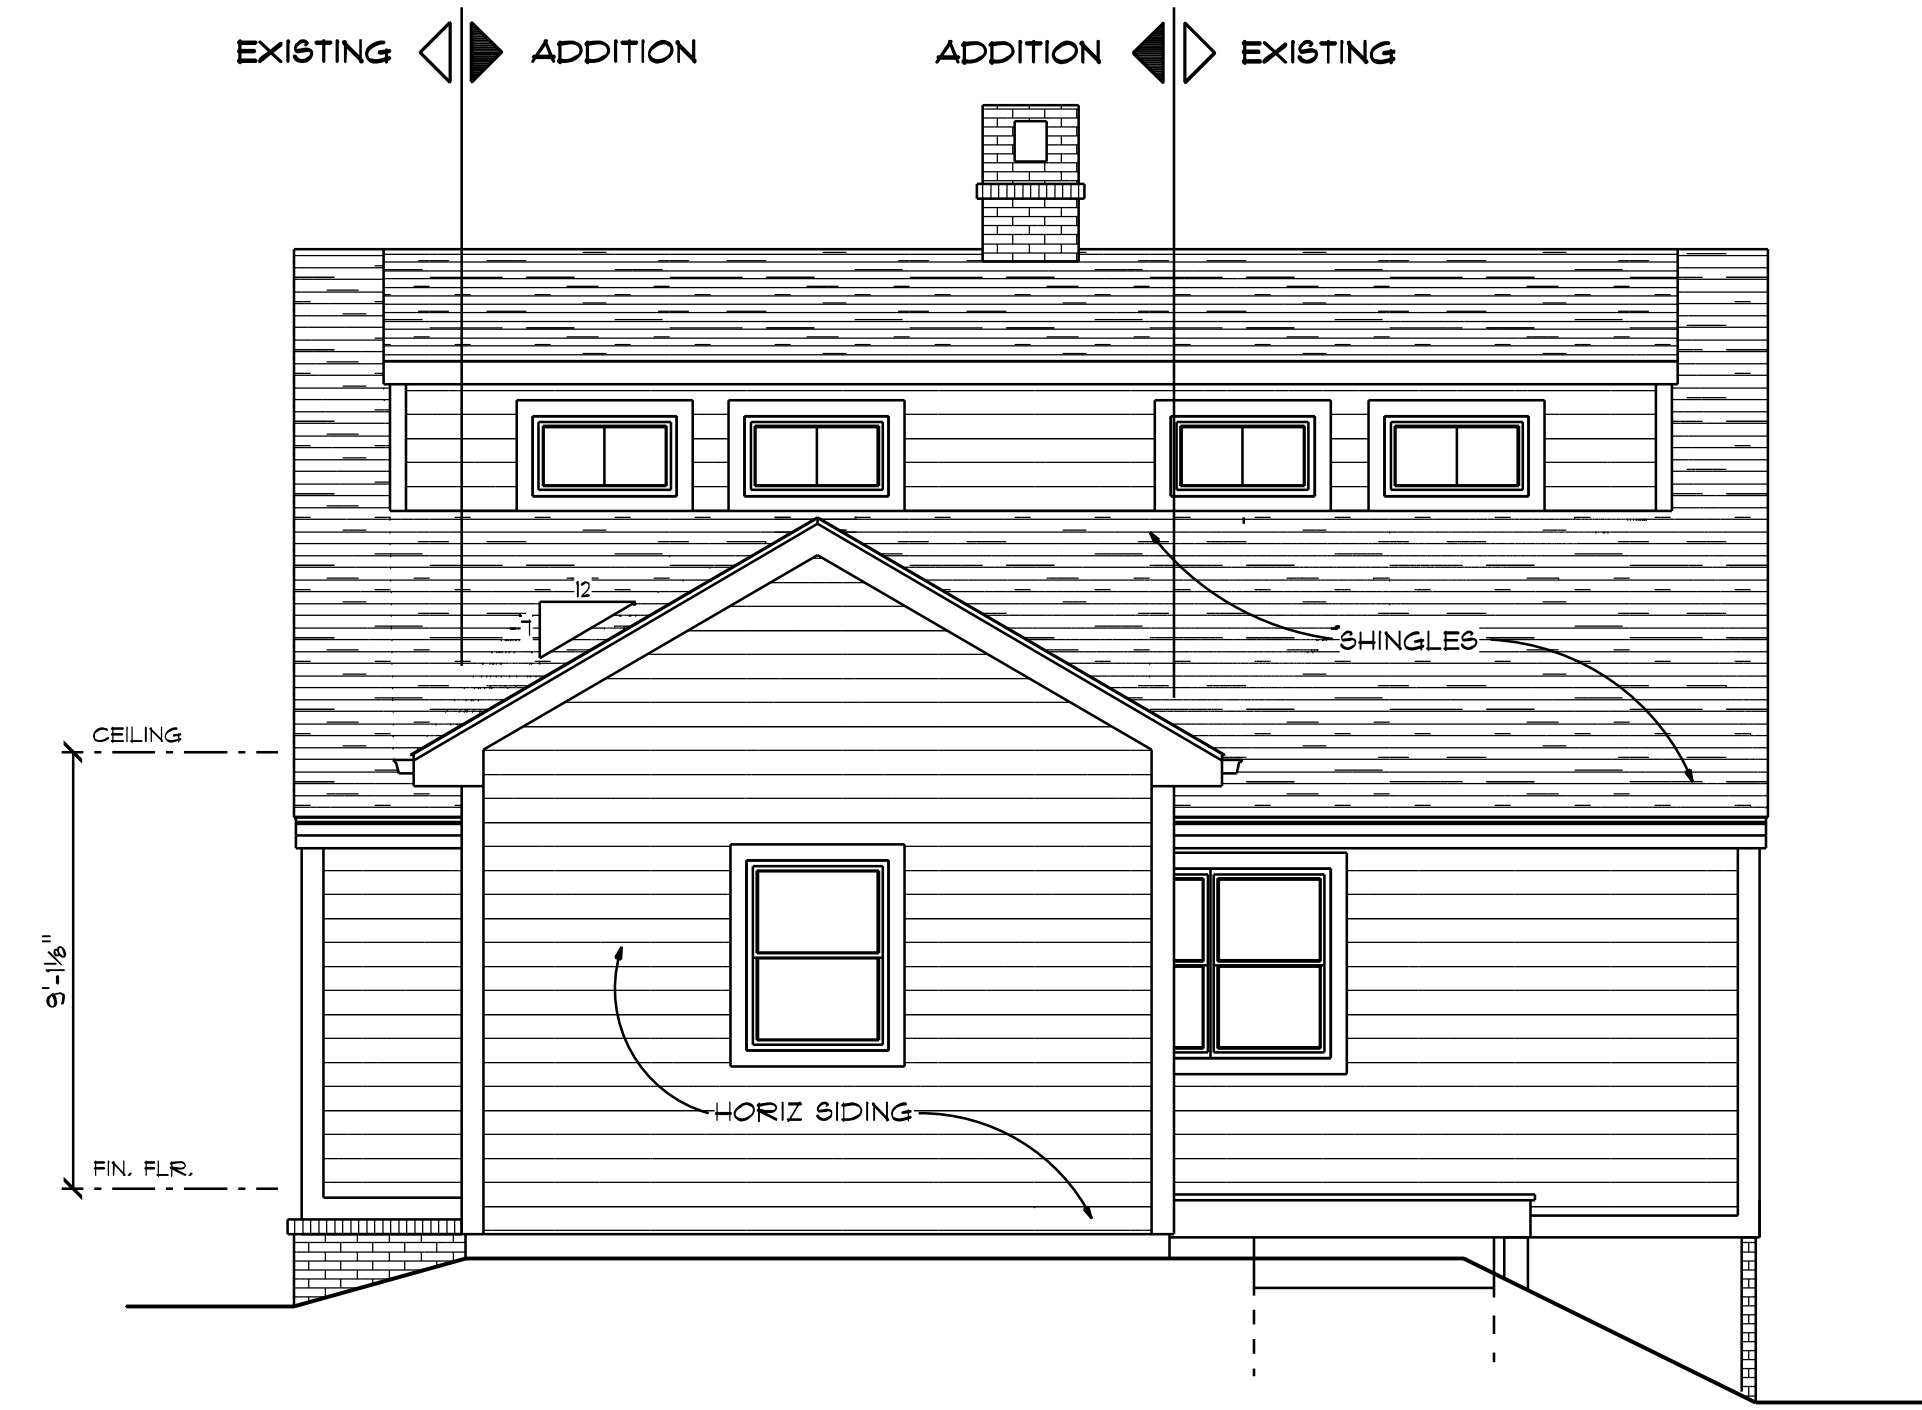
South elevation showcasing rear addition, deck, and shed dormers.
